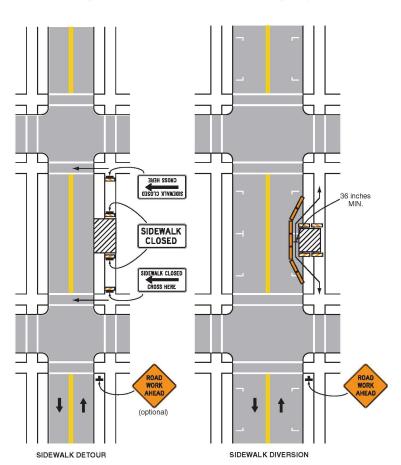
H-28. Sidewalk Detour or Diversion (TA-28)
